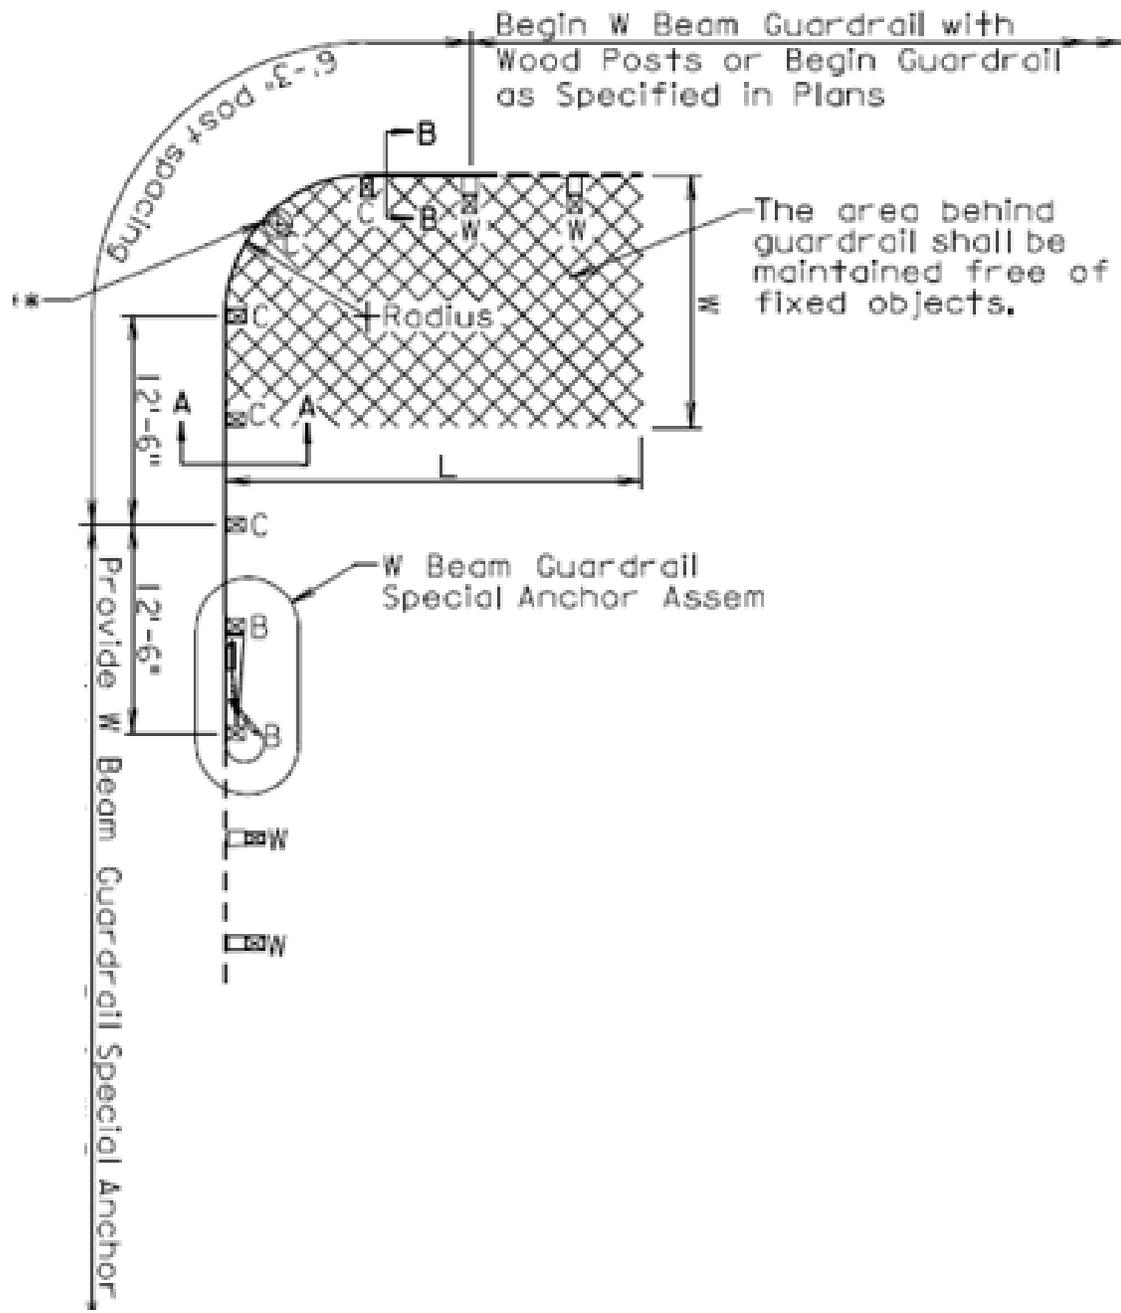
Nested Thrie Beam Transition and Short Radius Guardrail (21).
